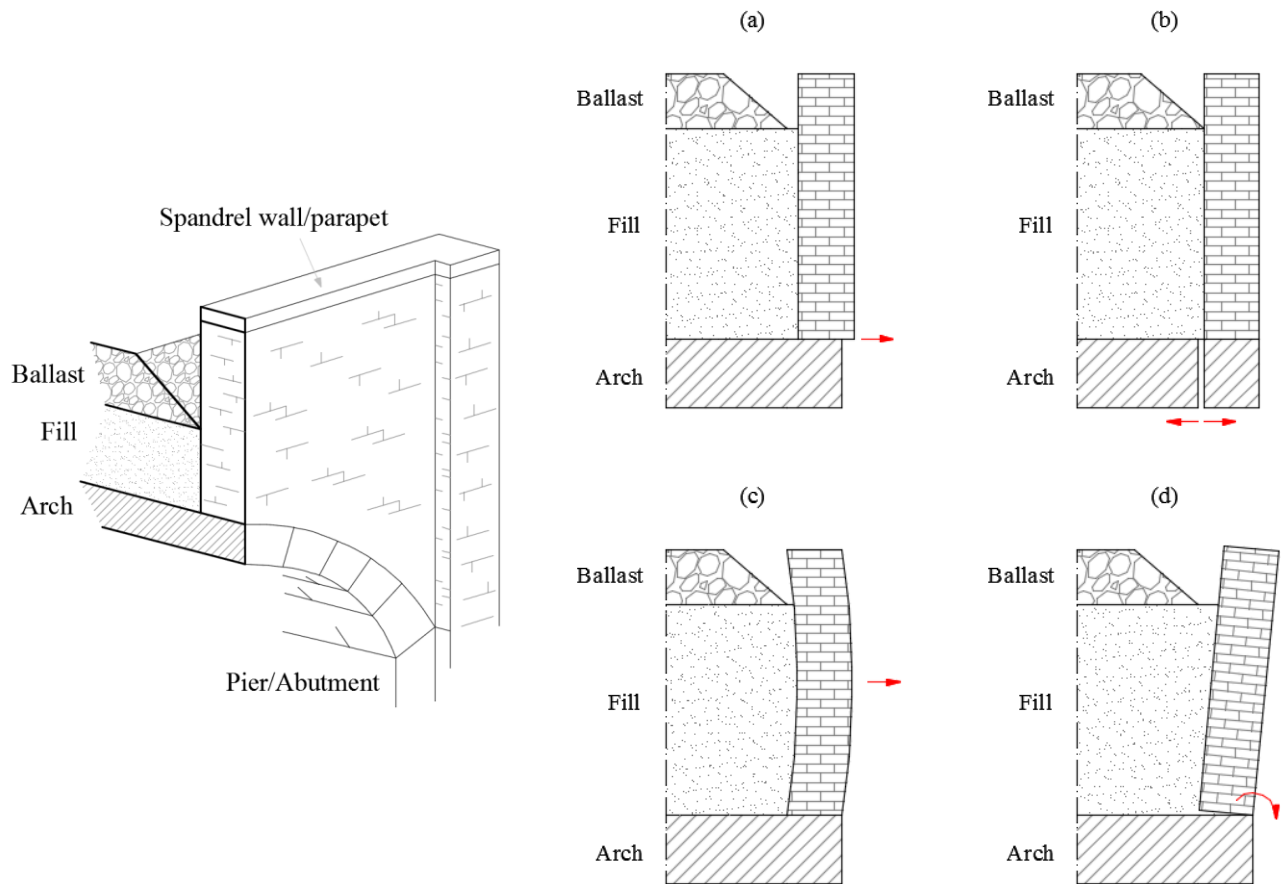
Axonometric section of the bridge and collapse mechanism of the spandrel wall: (a) sliding; (b) crack opening; (c) bulging; (d) overturning
